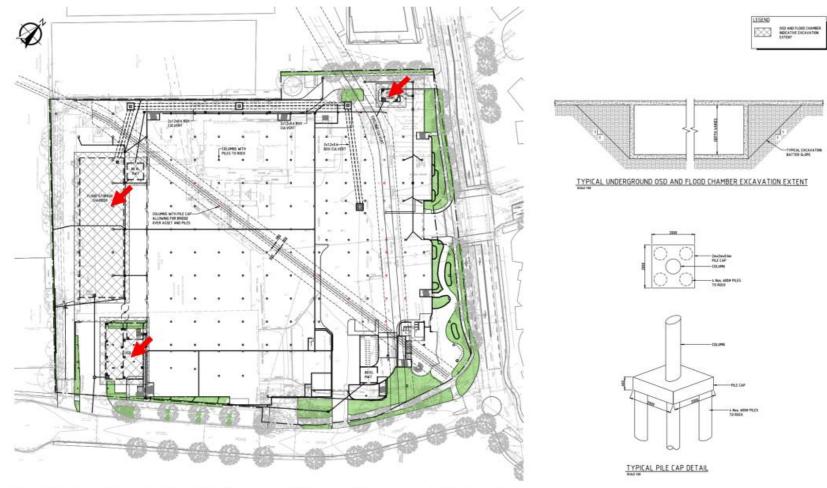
Excavation extent plan. Note the proposed bulk excavation areas marked by the red arrows. Source: Richmond + Ross, August 2020
